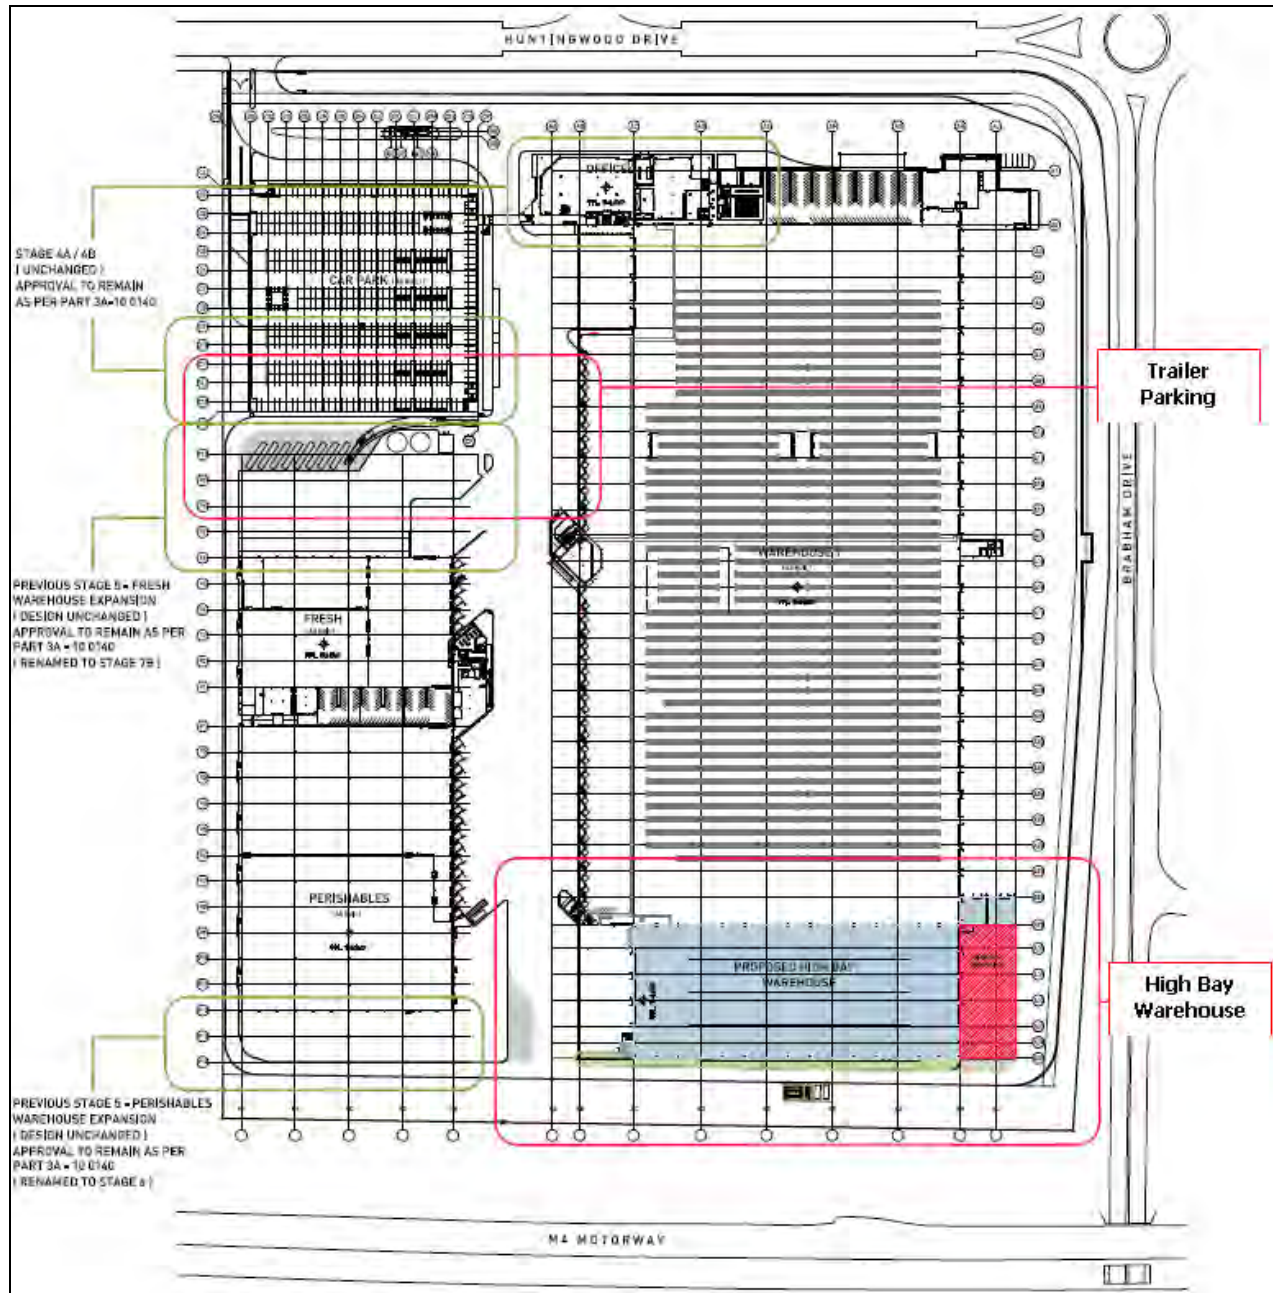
Proposed Amended Site Plan (Source: Giles Tribe Architects, 2012)
